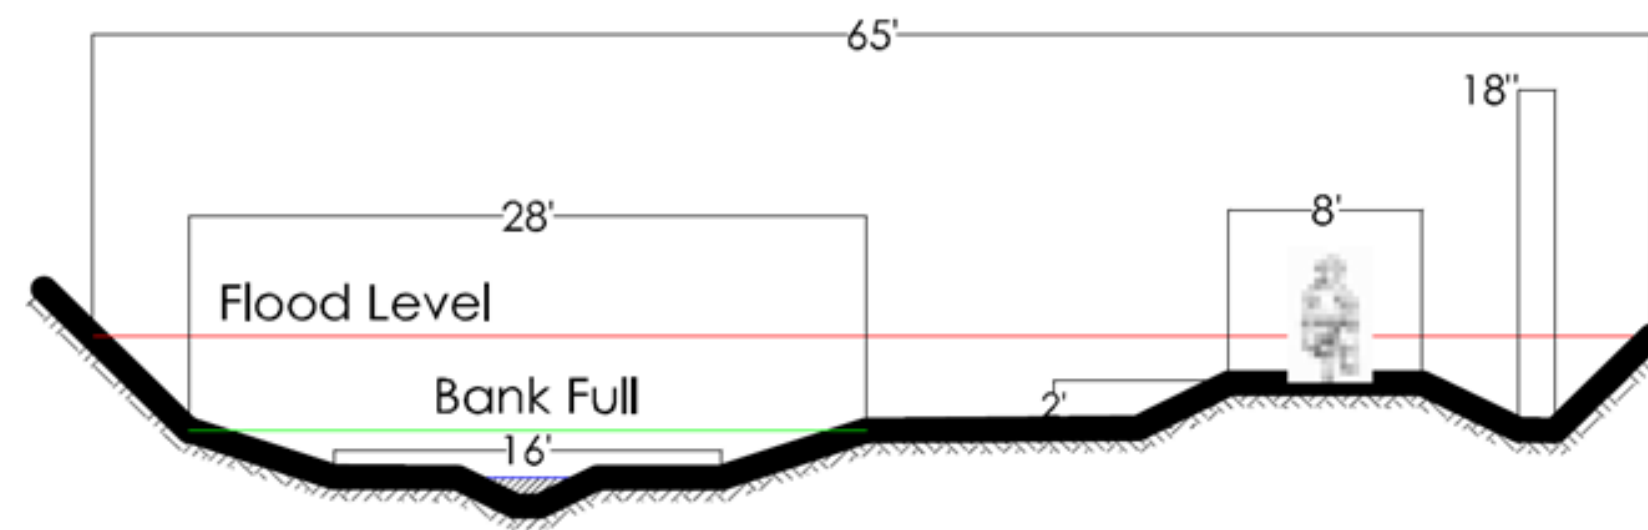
Paxton Creek Design Cross-sections: Channel Section | Maclay St. to Herr St.
